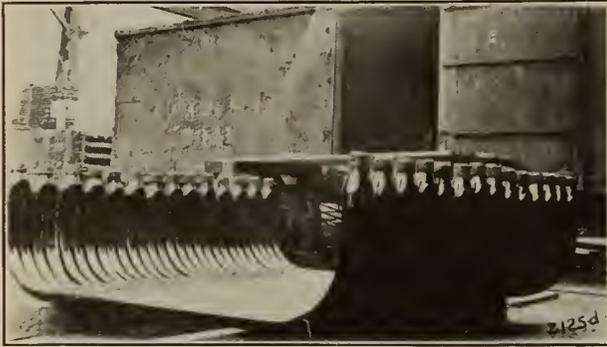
Bifurcated Tubes at Manufacturing Plant before Shipment.
